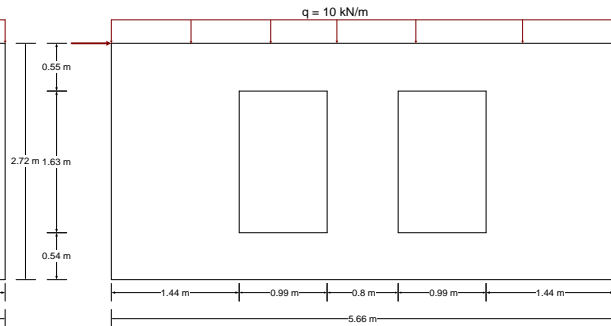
Wall 7: Irregular wall with $i_s = 0.333$
